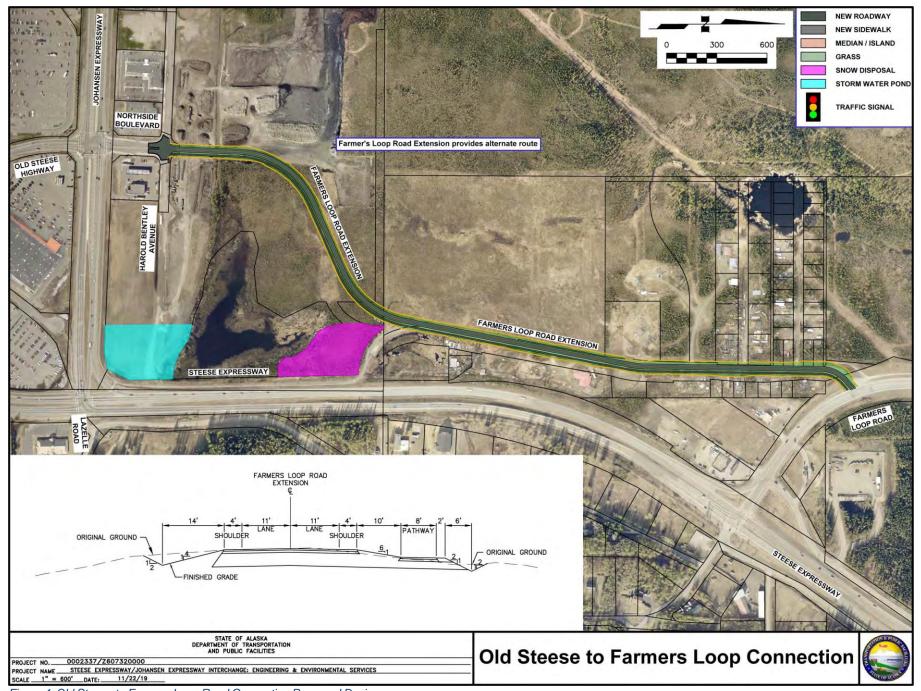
Old Steese to Farmers Loop Road Connection Proposed Design
